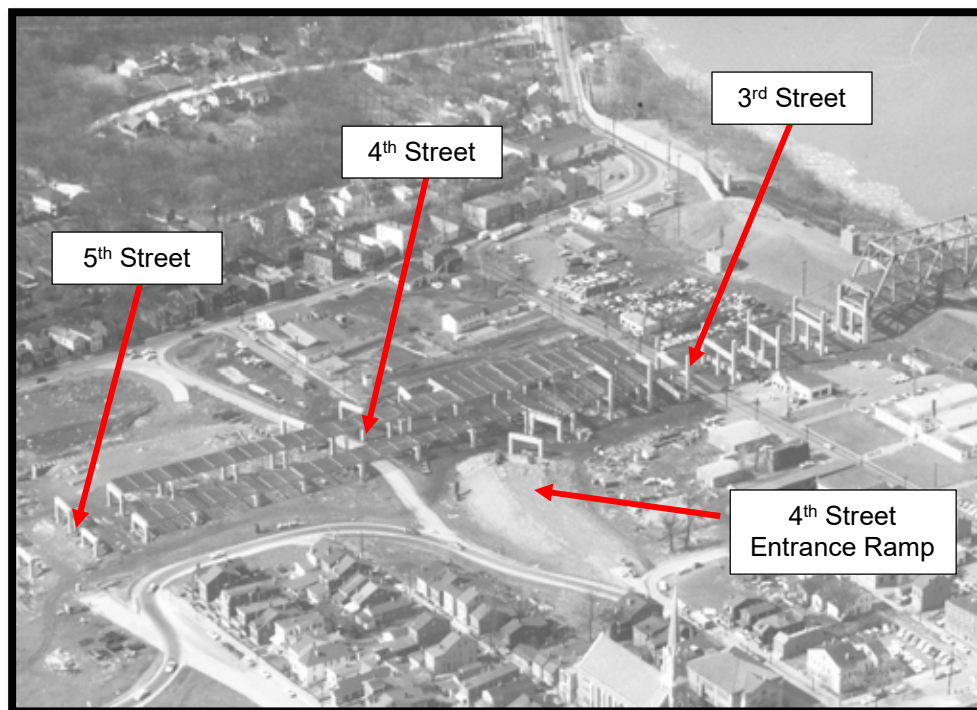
Circa 1963 photos depicting the construction of Bridge No. 059B00040N/Third, Fourth, and Fifth Street overpass approach of I-75/71 to Brent Spence Bridge (Bridge No. 059B00046N).
